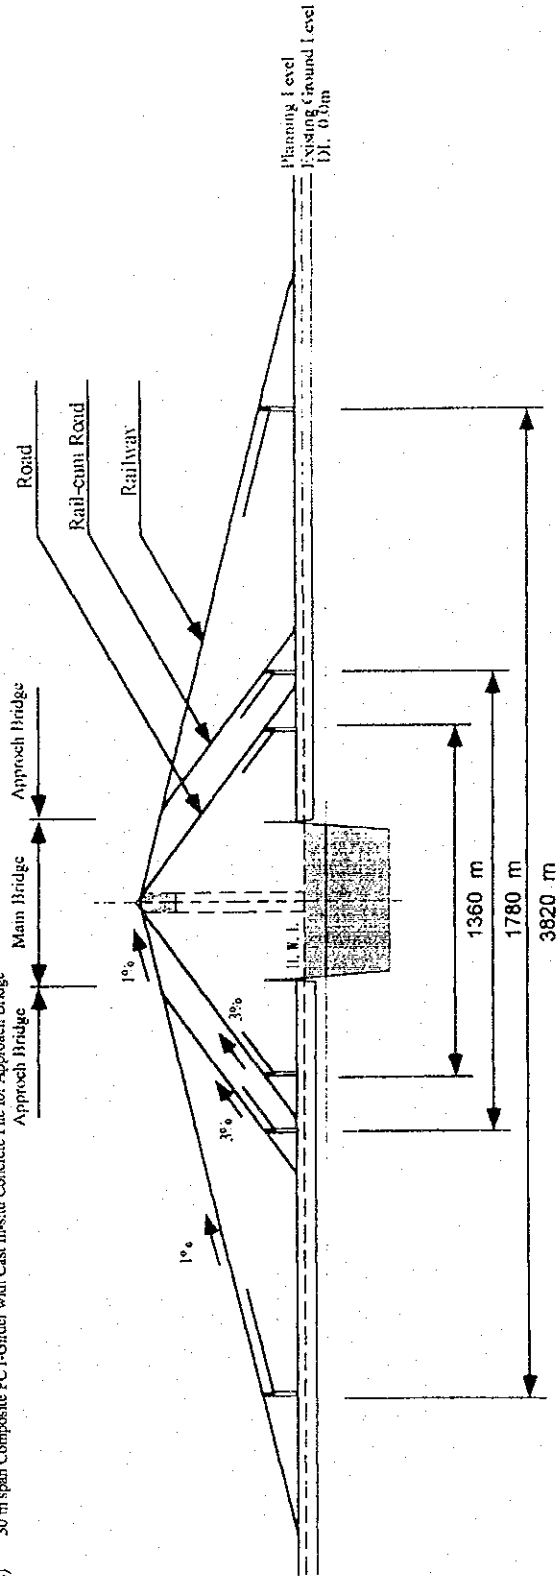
Comparison of Length and Cost of Road Bridge and Rail-cum-Road Bridge
